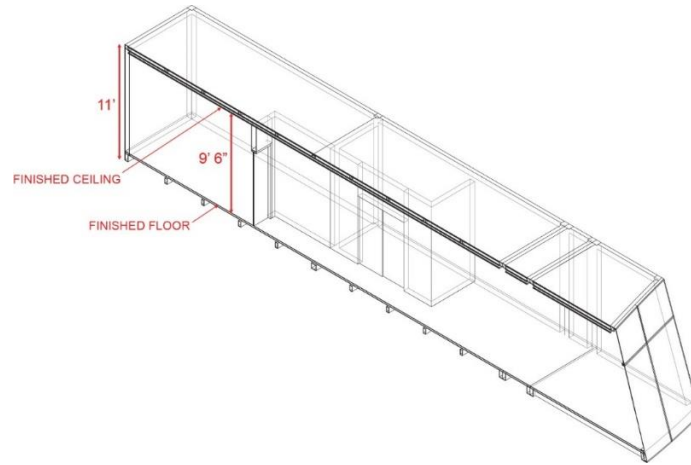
Unit A module 4 section showing exterior height and interior floor-to-ceiling height.
